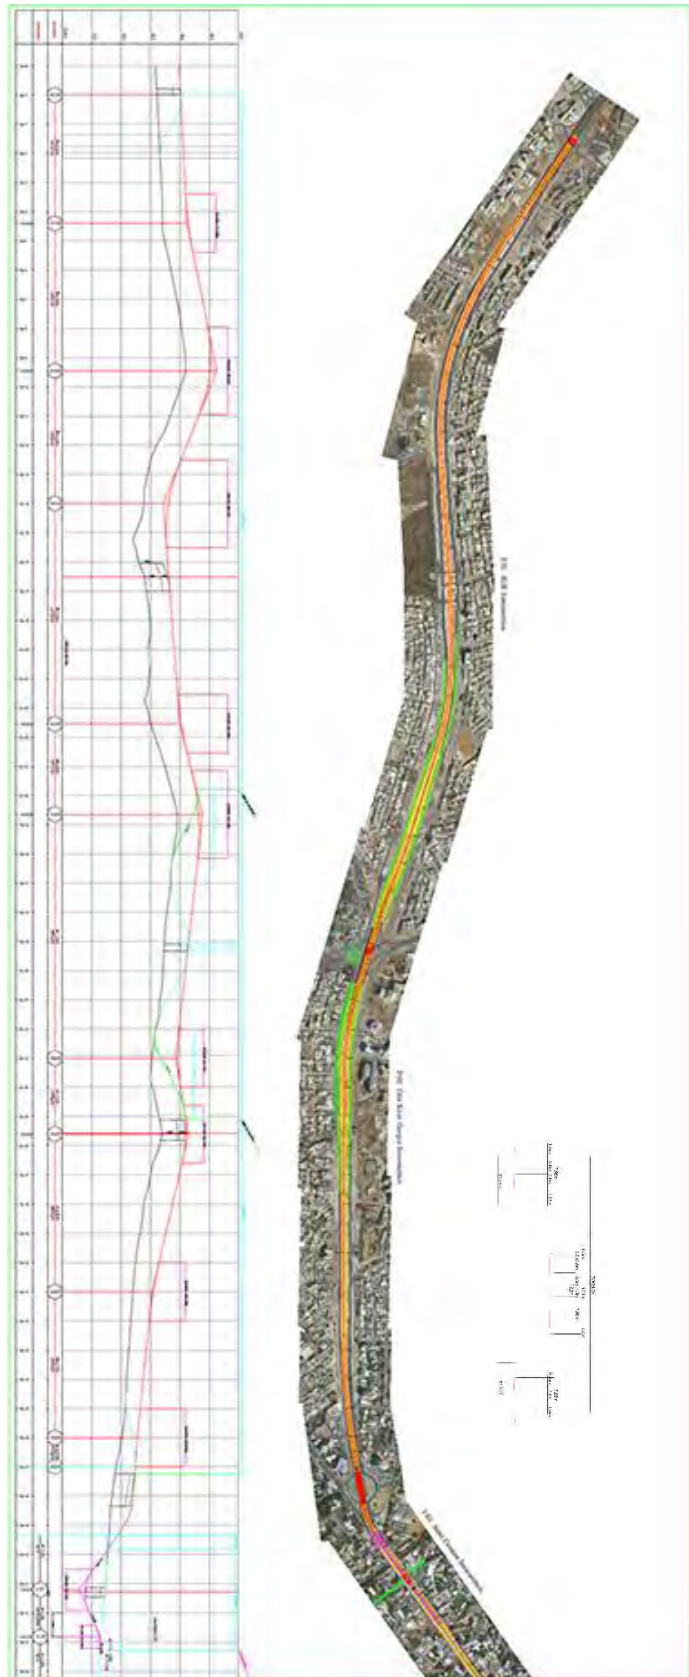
Main Water Facilities Around SDE Intersection
